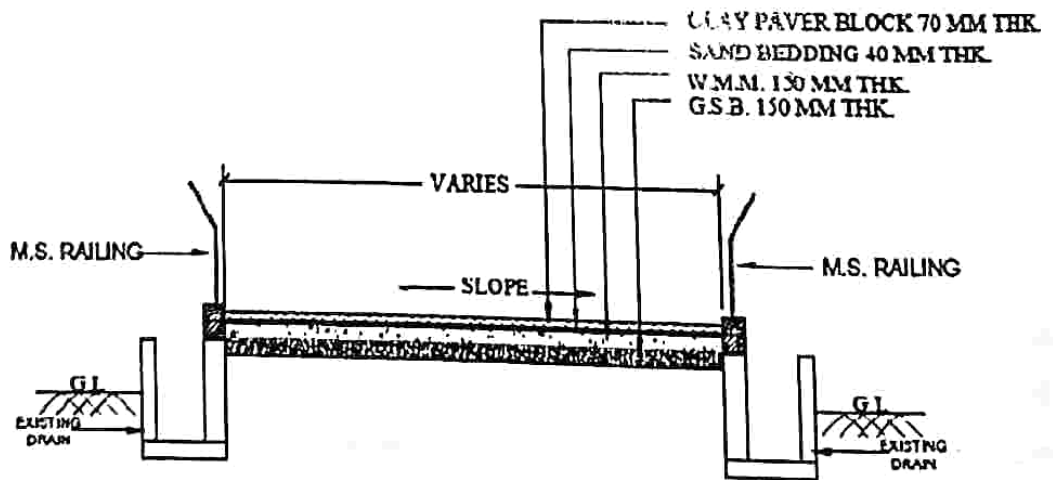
Typical cross-section of pathway adopted at the site (as provided by MHSMC)
